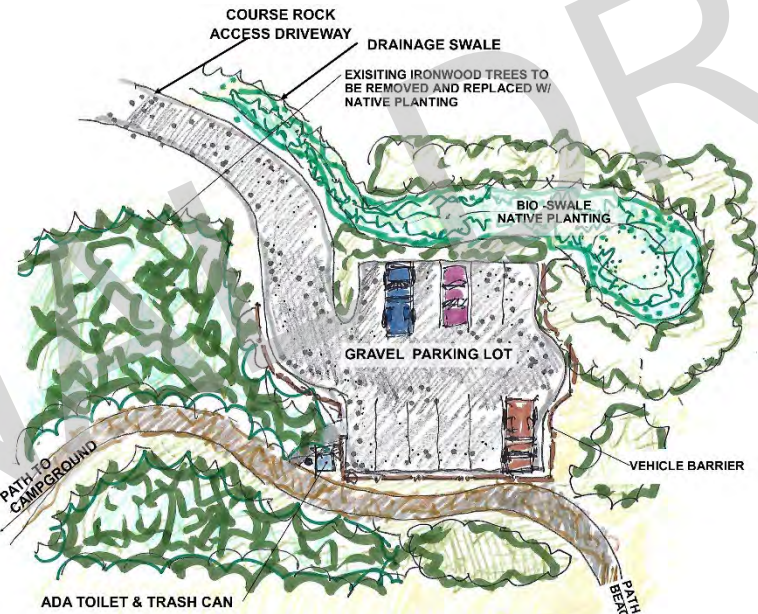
Keonehelele‘i Beach Access Driveway Parking Plan.
